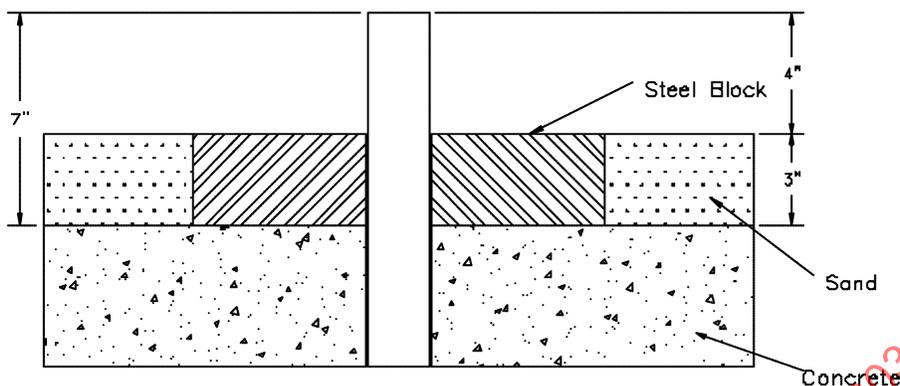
B—SAND BASE IMPACT TEST FIXTURE
